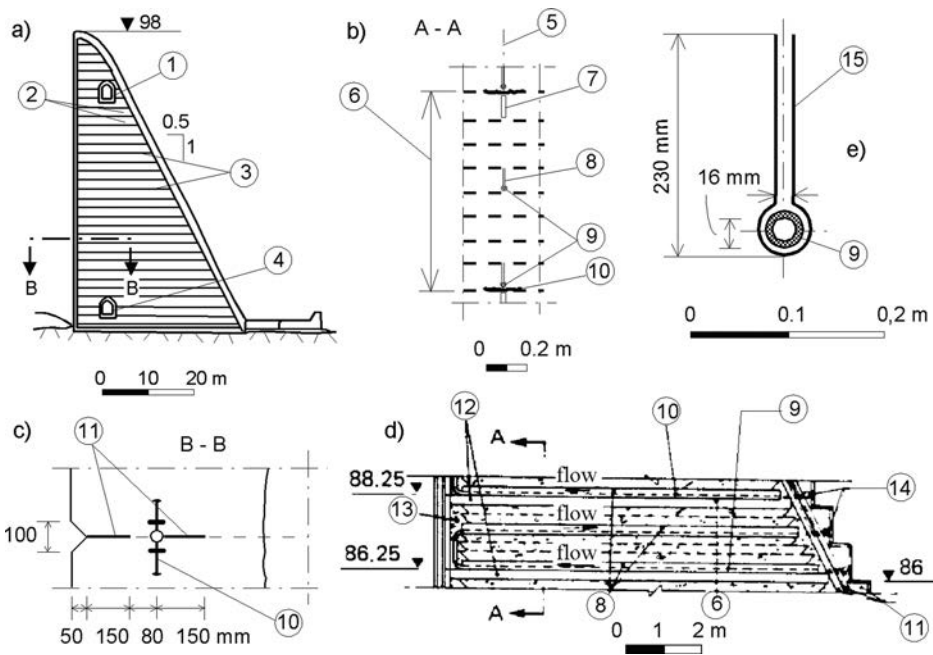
Details of exciters and rectifiers of cracks for the Wolwedans dam. (1) Monitoring gallery; (2) sections for grouting, 2 m high; (3) PVC waterstops, 250 mm, for limitation of the sections for grouting; (4) main drainage gallery; (5) vertical section of exciters of cracks; (6) eight layers of roller-compacted concrete, 250 mm each, forming one grouting section between waterstops; (7) dual PVC sheet of 250 microns, with a role of rectifier of cracks without a pipe; (8) rectifier of cracks (see also under e); (9) perforated pipes of 40 mm for supplying grouting mixture; (10) PVC waterstops of 250 mm; (11) exciters of cracks, 150 mm wide, 2 mm thick; (12) unit plastic exciters of cracks; (13) surface concrete; (14) galvanised steel pipes, 32 mm internal diameter, for supply of grouting mixture; (15) 250 microns thick PVC sheet.
